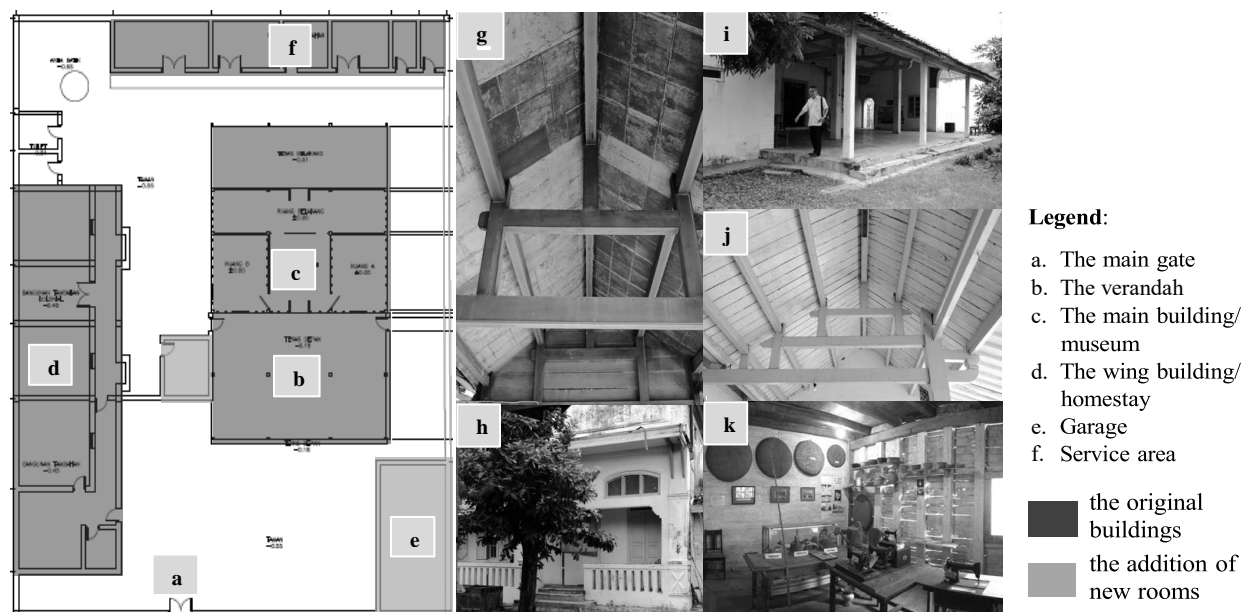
The floor plan showing the transformation of the main building and the left wing of the Museum, (g) the exposed roof construction frame, (h) the left wing with the Dutch colonial style, (i) the verandah with wood frame structure, (j) *Dou gong* wood construction system, and (k) the museum room with the collections
